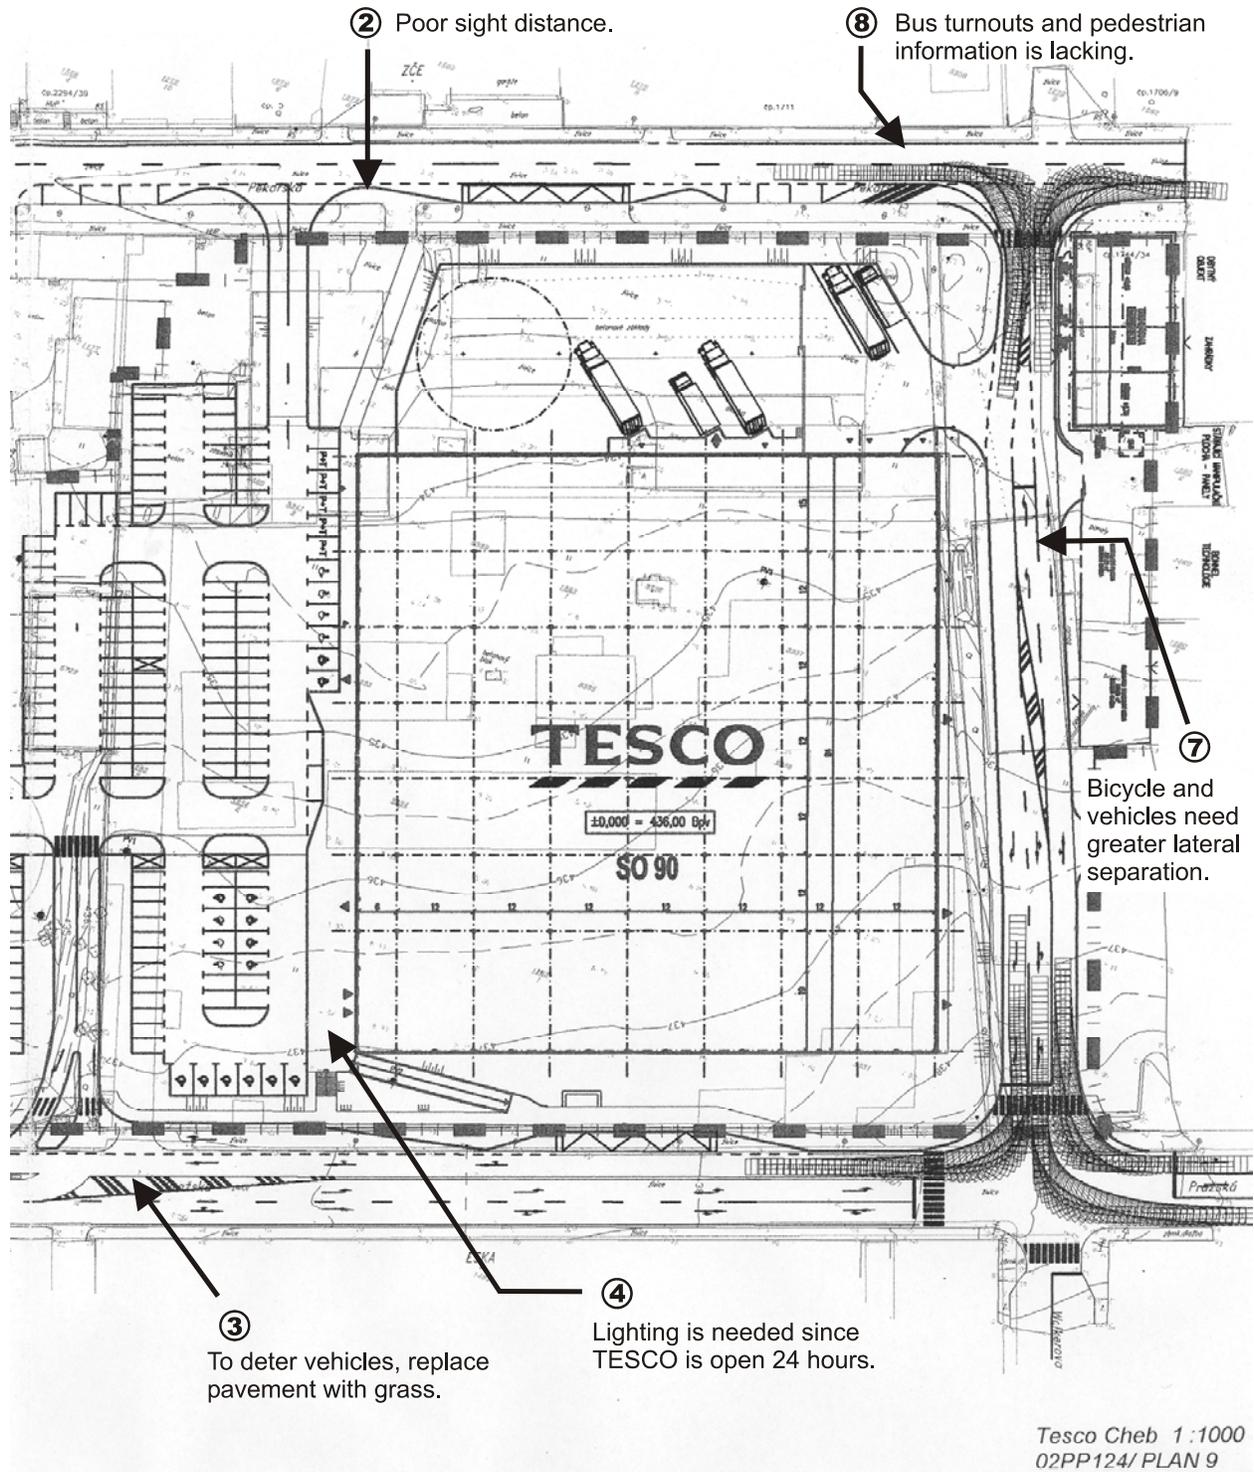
Site Plan Review for the TESCO Road Safety Audit (Right Half)
